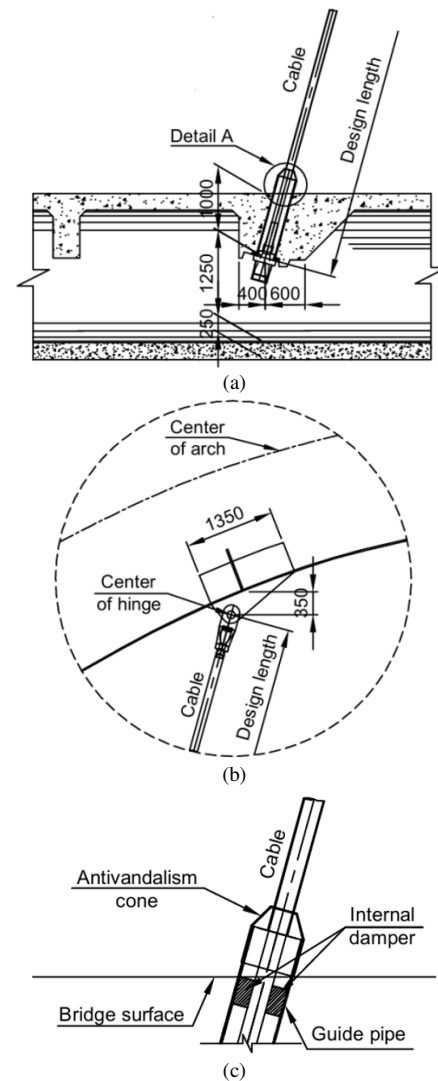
A typical cable: (a) fixed anchorage, (b) hinge, (c) detail of section A.
